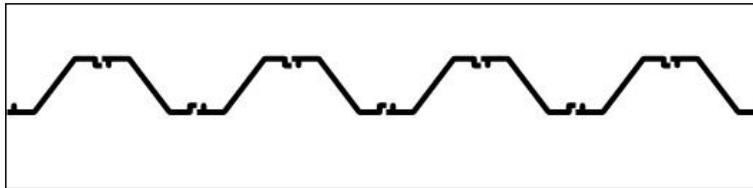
Schematic of a “Standard Z” type sheet pile wall
